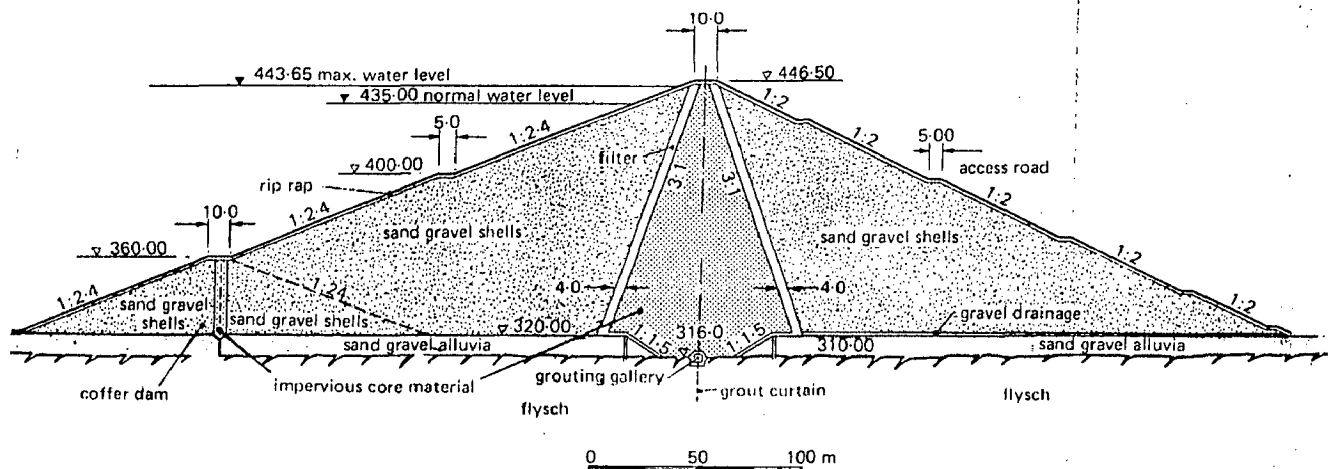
The typical cross section of the Mornos Dam, Greece.
